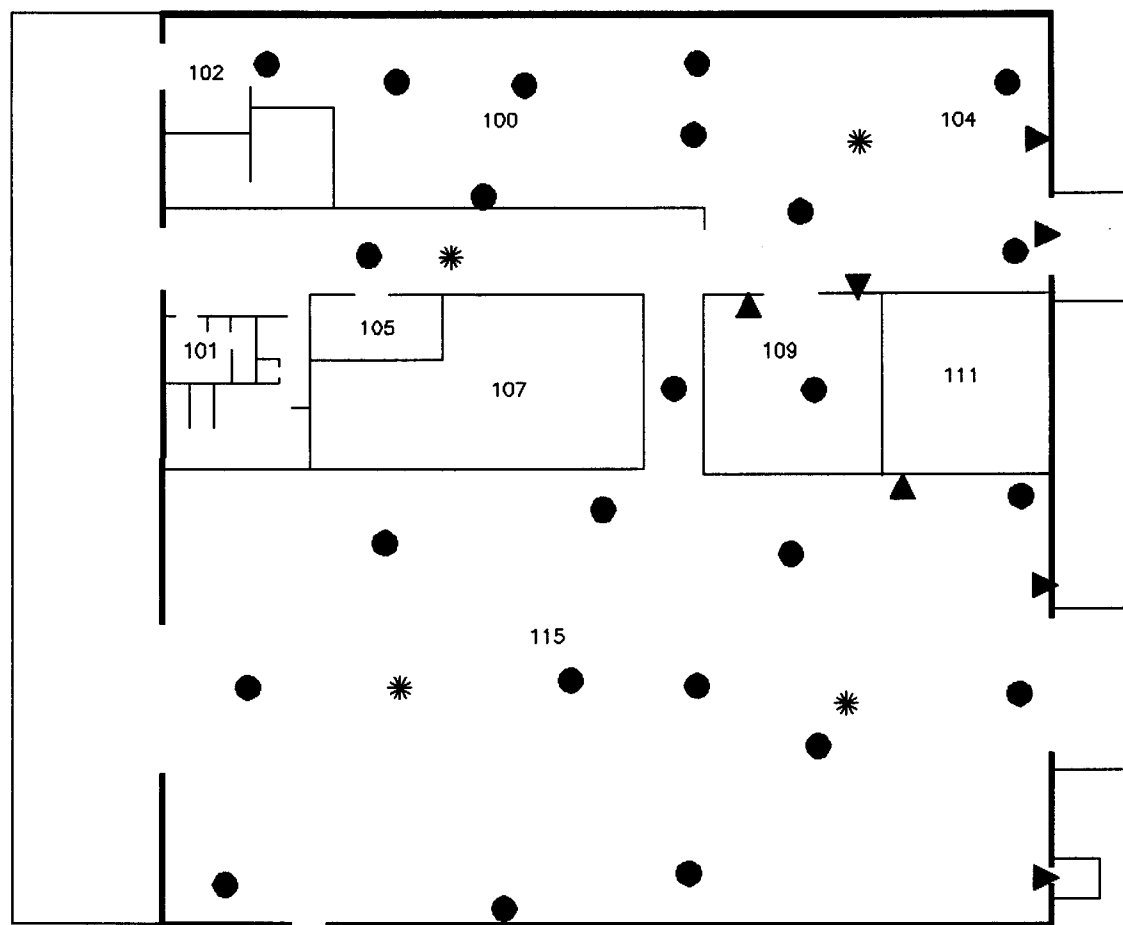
Building T641 – Floor Plan and Measurement and Sampling Locations
